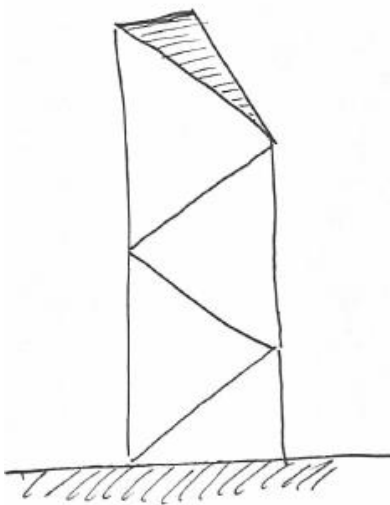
A space structure is essentially a 3D truss beam cantilevering from the ground.
